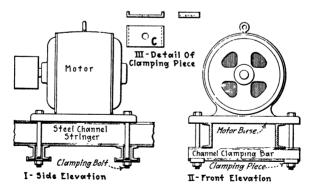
Method of attaching a motor to channel stringers with channel clamping bars.
